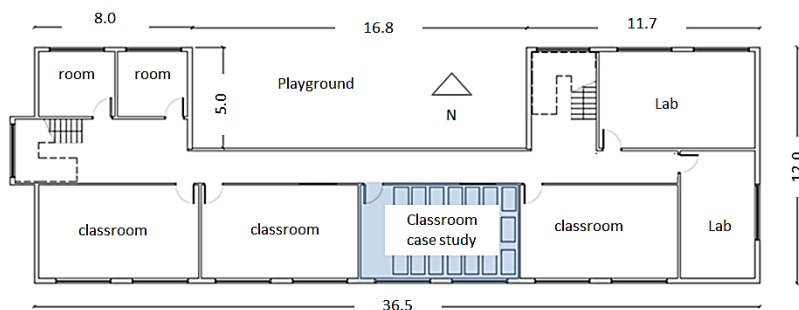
typical floor plan of typical governmental primary school and selected reference case classroom
